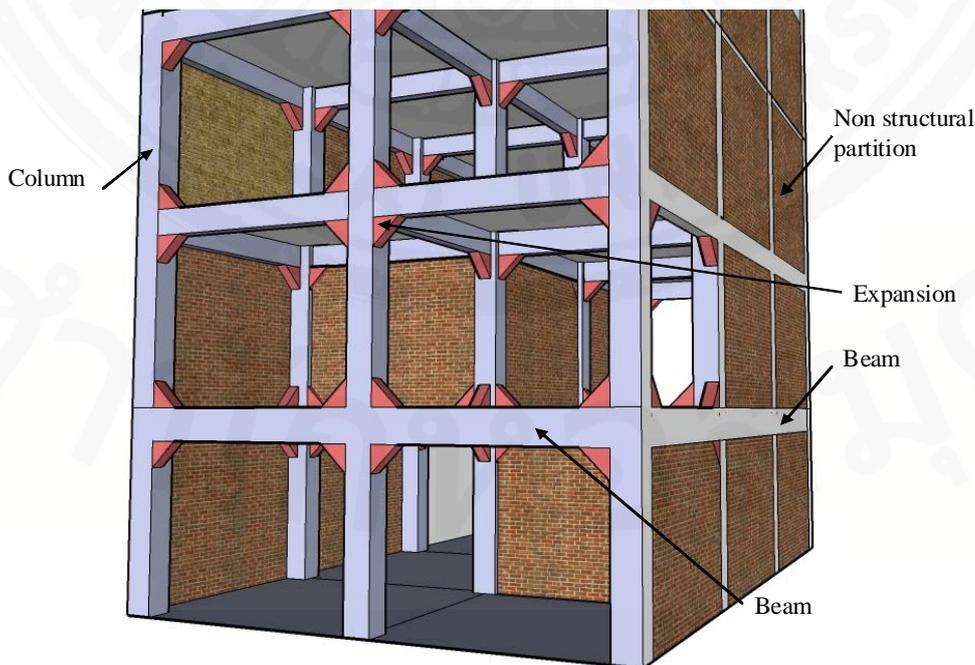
3D Building beam-column frame system retrofitted with planar joint expansion
